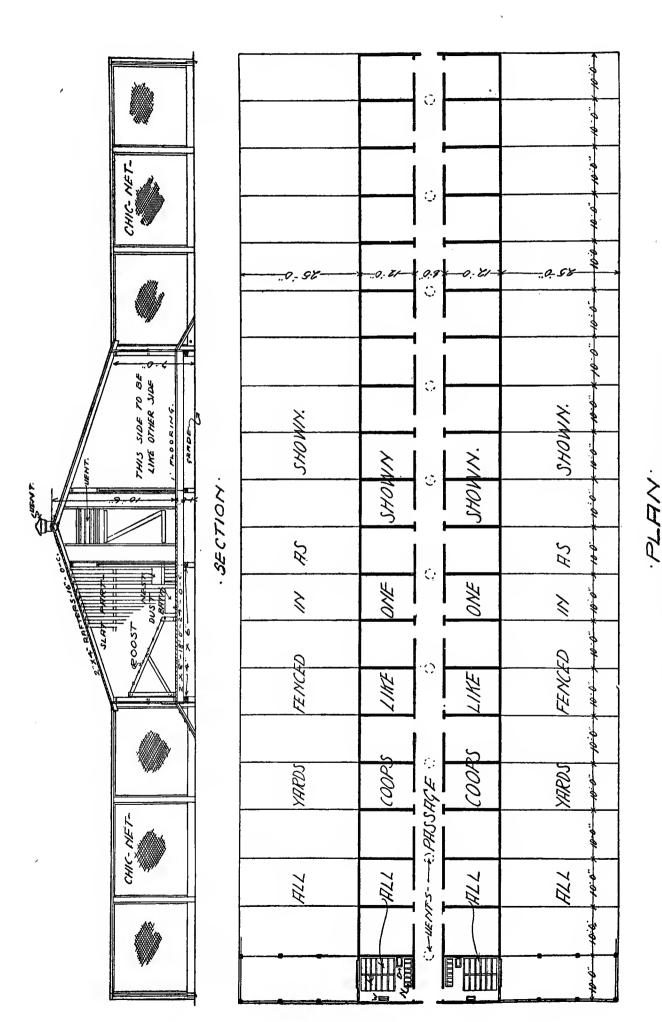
POULTRY HOUSE WITH OPEN YARDS
